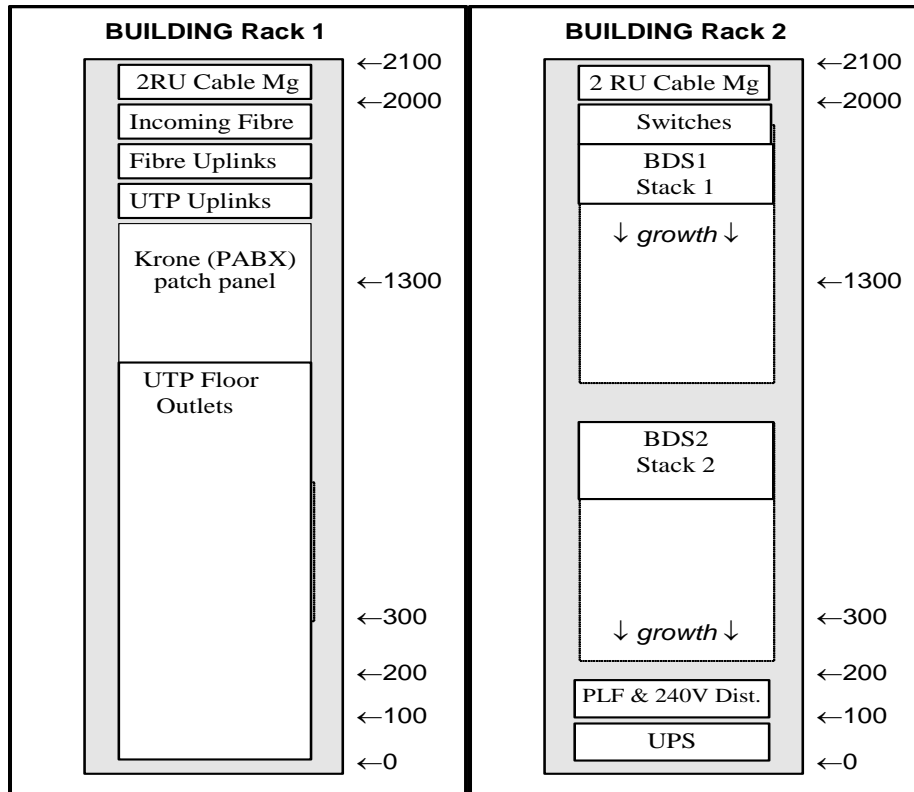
FLOOR Distribution - equipment rack layout using two racks
